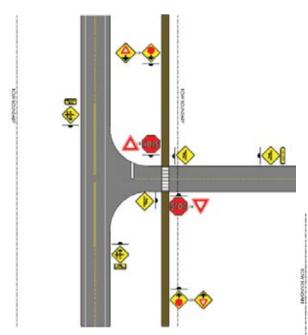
Example Signage Plan for Trail Crossing Side Road Outside the Clear Zone (Alberta Transportation)
